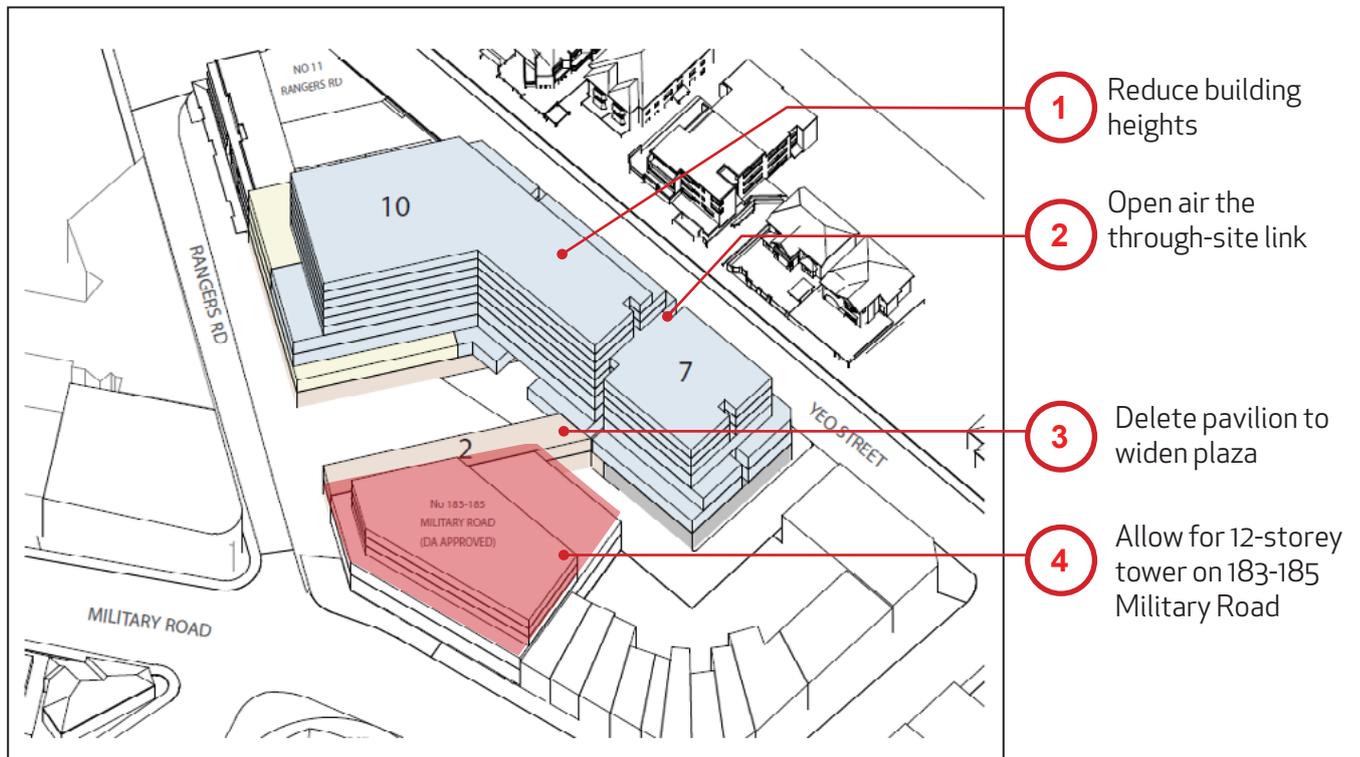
Yeo St PP, Proposed envelop (source: Woolworths Planning Proposal)
